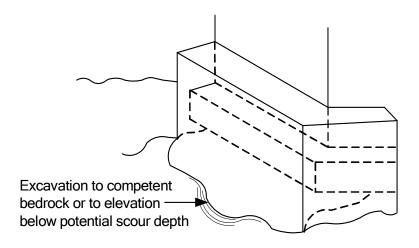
Concrete Footing Apron to Protect a Spread Footing from Undermining
